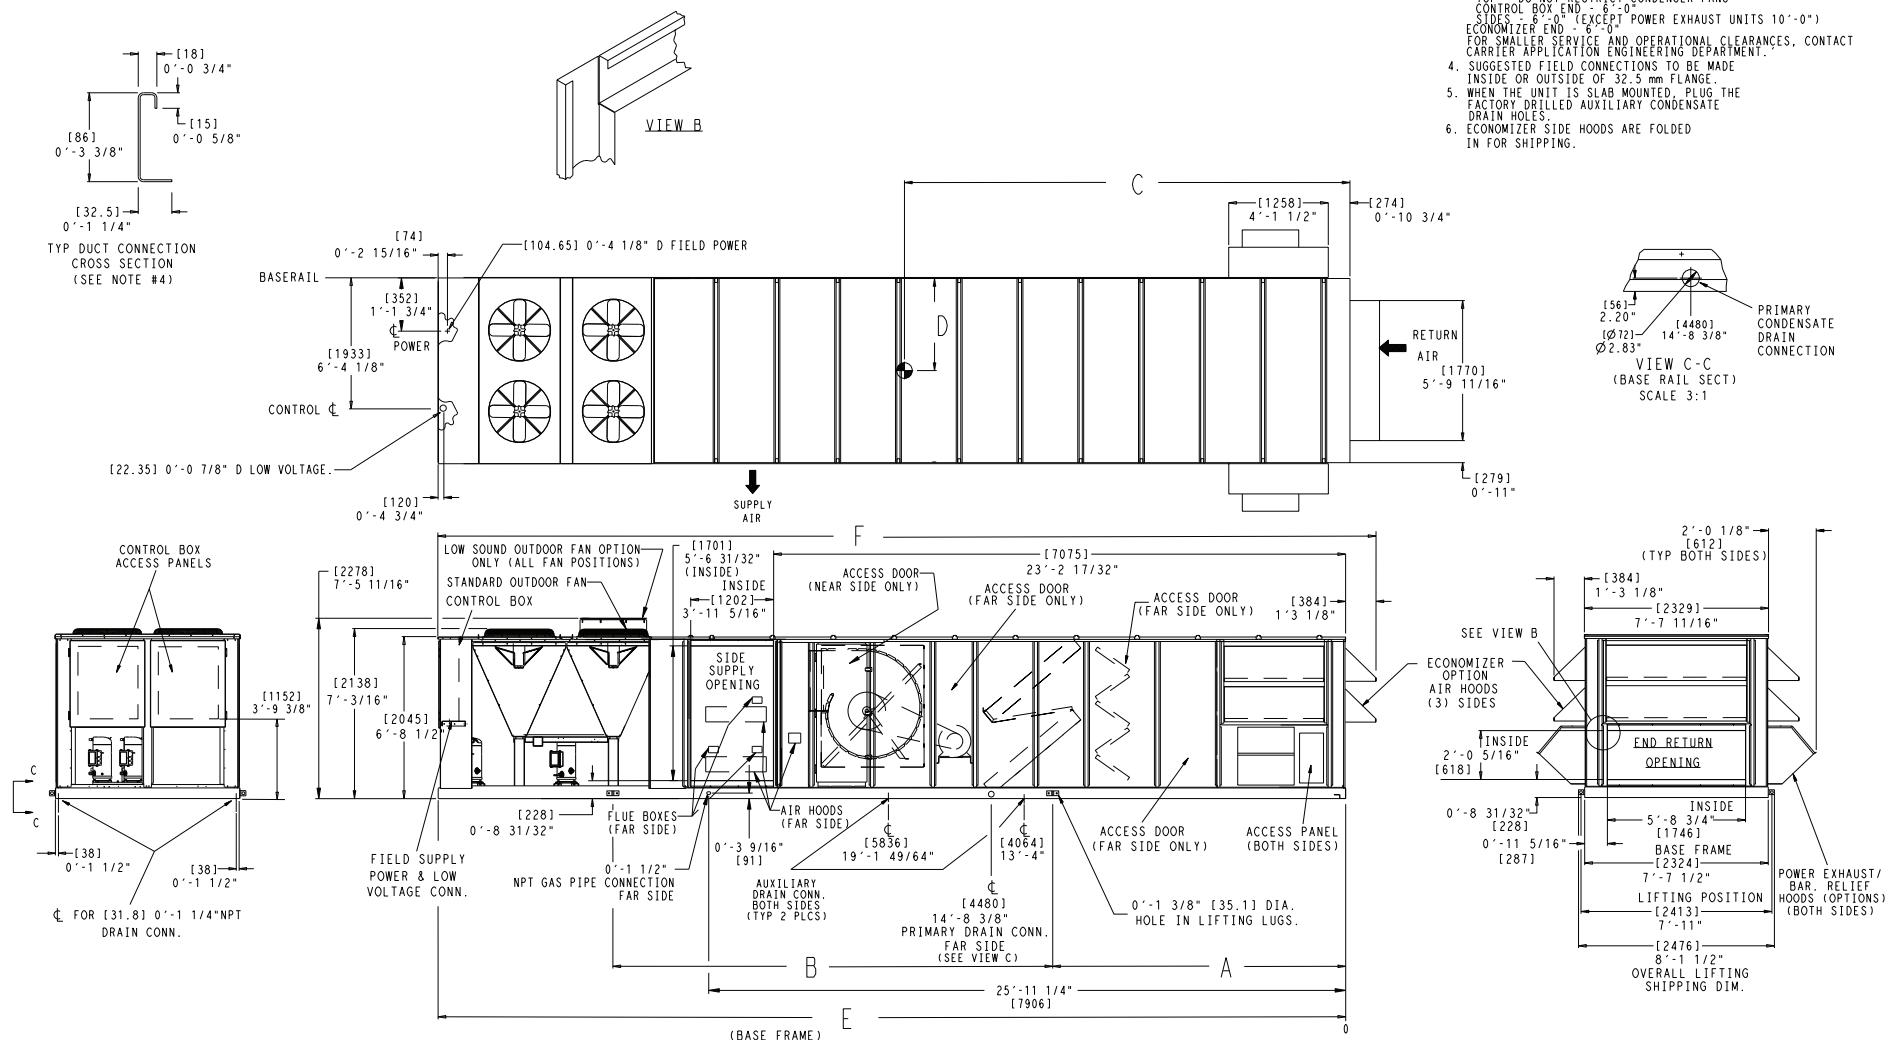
Base Unit Dimensional Drawing — 48P4,P5,P8,P9070 (Standard Chassis Unit Shown)
